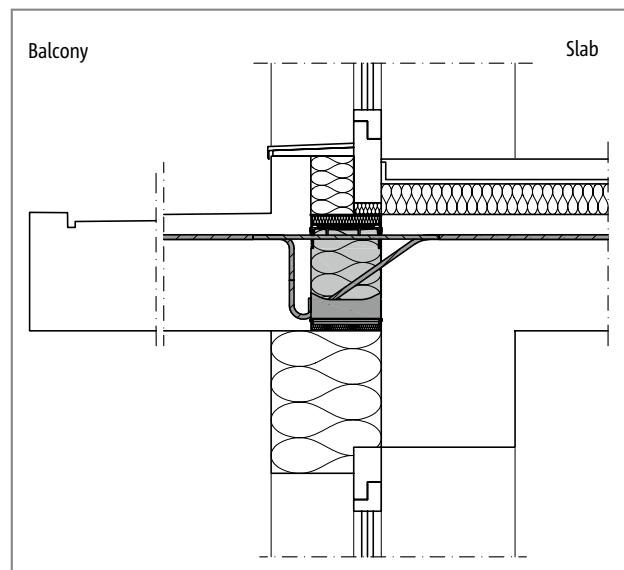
Schöck Isokorb® XT type K: Connection with window detail above and below the connection
